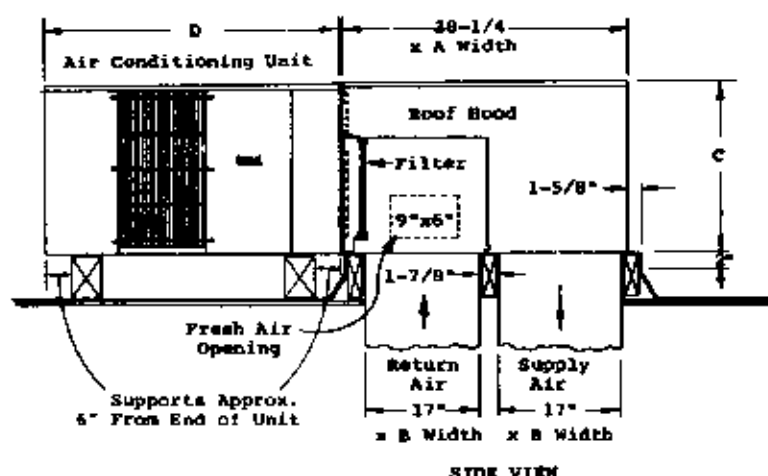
UNIT AND ROOF HOOD DETAILS
